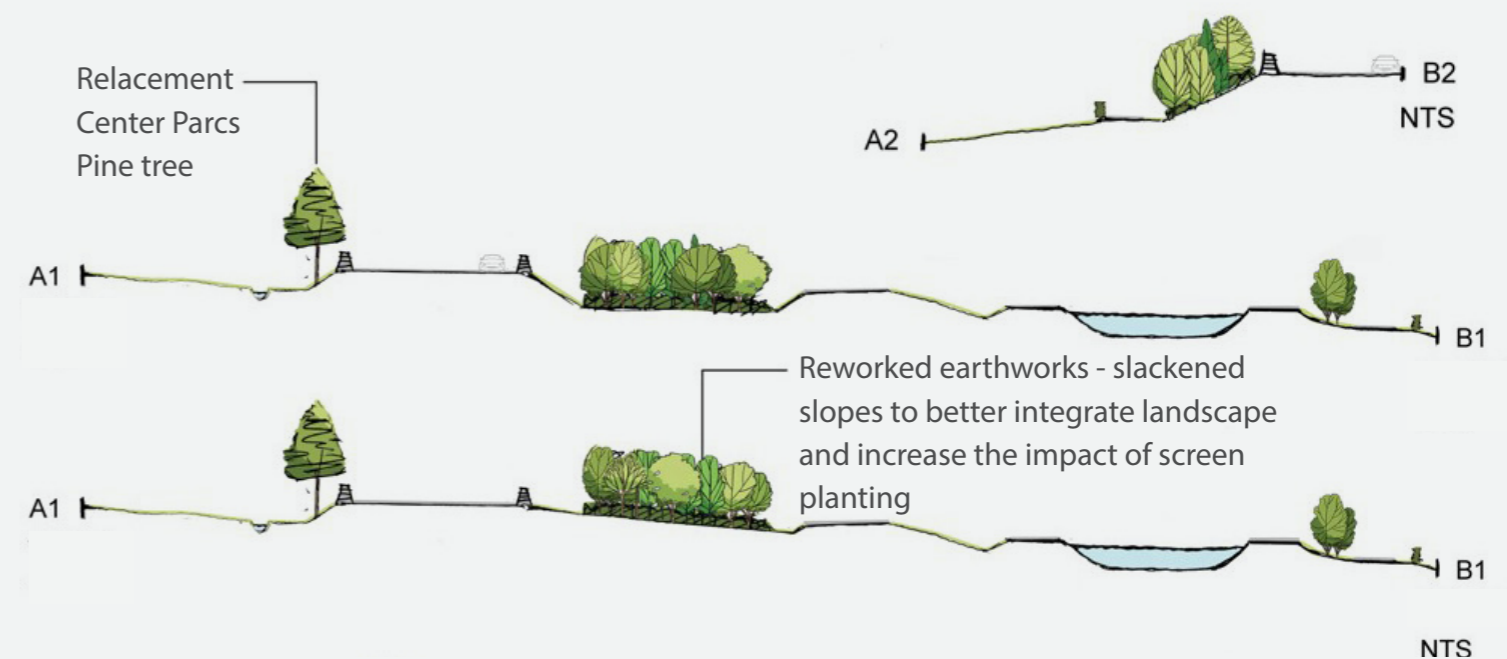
Sketch sections through Junction at Center Parcs to resolve design of earthworks
